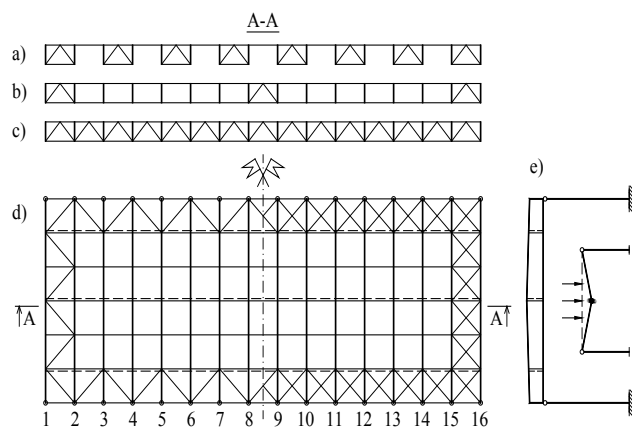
Girder bracings: a) in pairs, b) key lateral, c) continuous lateral, d) slope, e) spacing on the girder + beam failure mechanism
